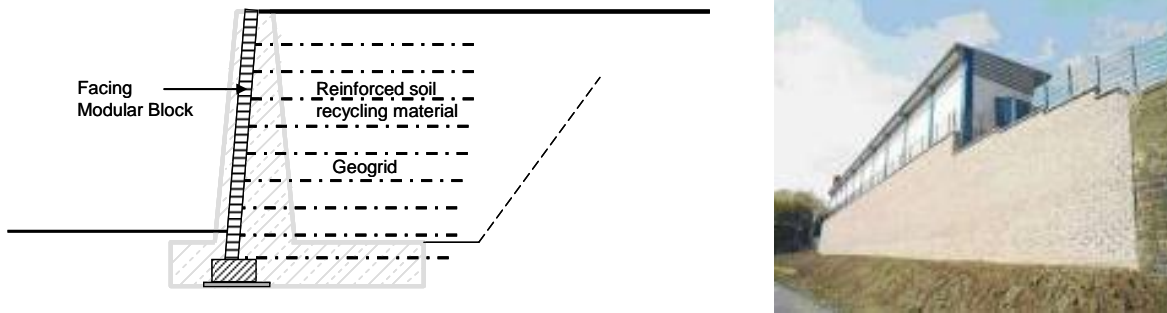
Cross section of constructed geogrid reinforced structure and picture after the construction e
